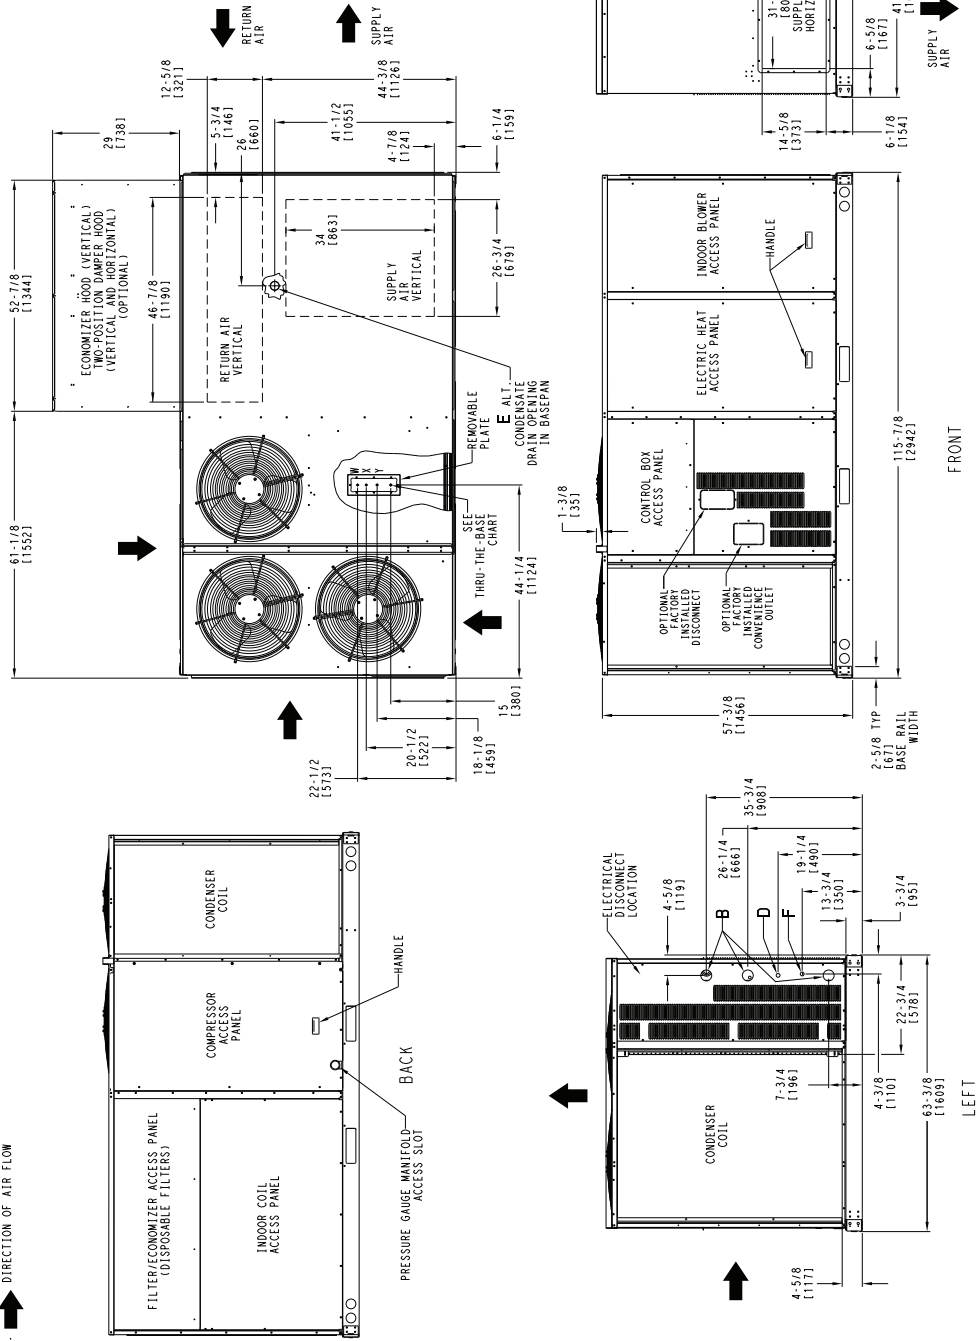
Dimensions RAS180 (Sheet 1 of 2)
